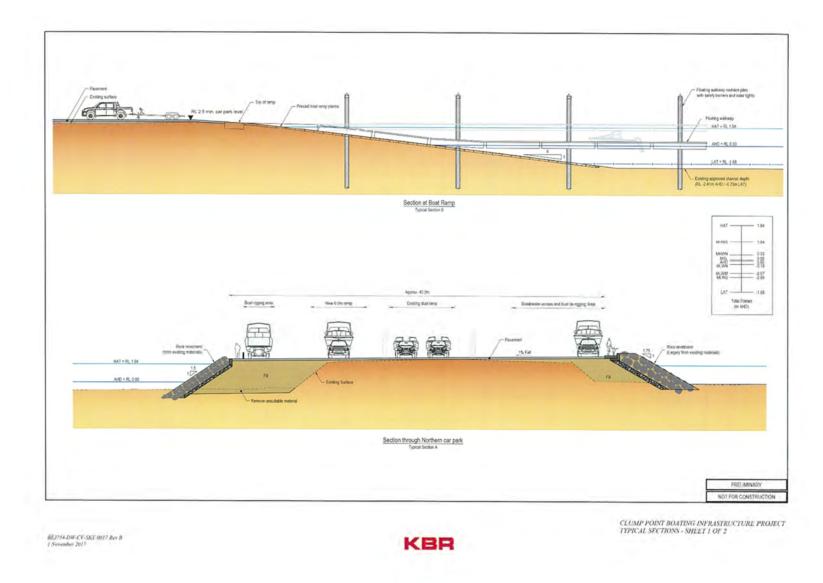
Project Design Cross-Section – Boat Ramp and Existing Breakwater Upgrade
